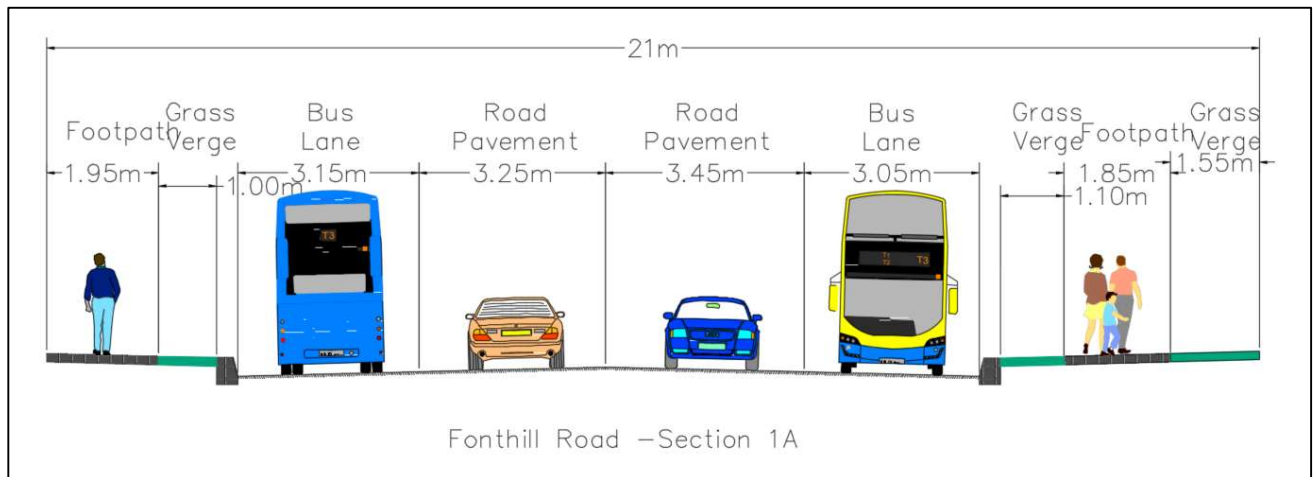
Existing Cross-section 1A (Fonthill Road)
